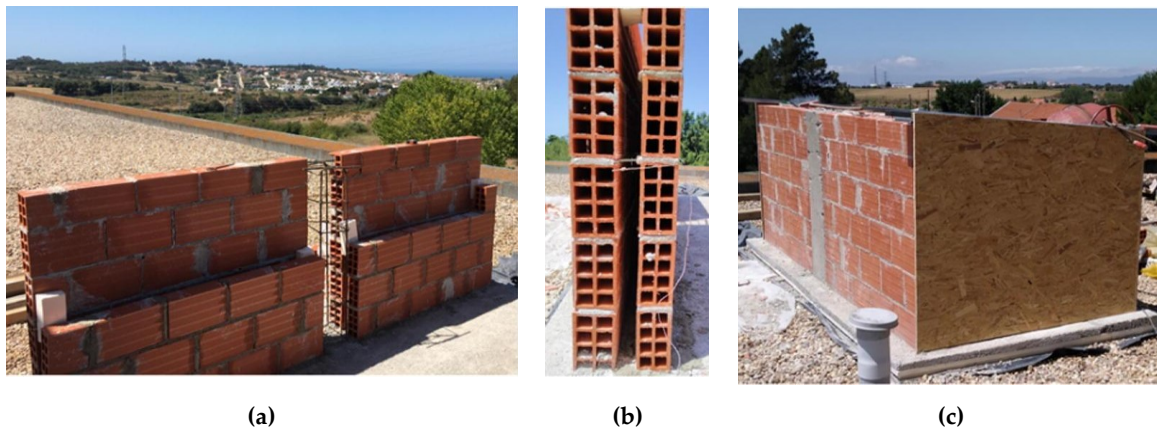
Construction of the test cell: (a) South-facing wall based on a cavity wall made of clay hollow bricks; (b) Side section of the South-facing wall, (c) South- (cavity wall with a concrete column in the middle) and East-facing (OSB) walls [78].
